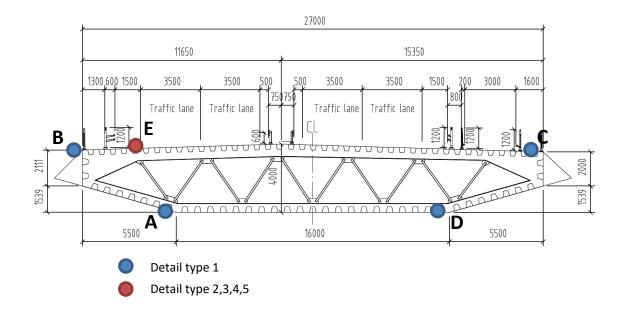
Locations on bridge girder subject to fatigue checks – Points are identified by letters A to E
